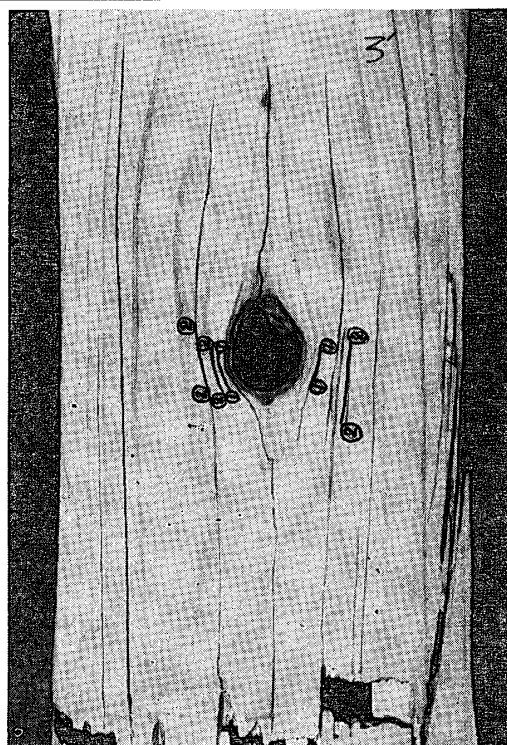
Pith side face of knotty specimen after failure test (Specimen No. 3).
